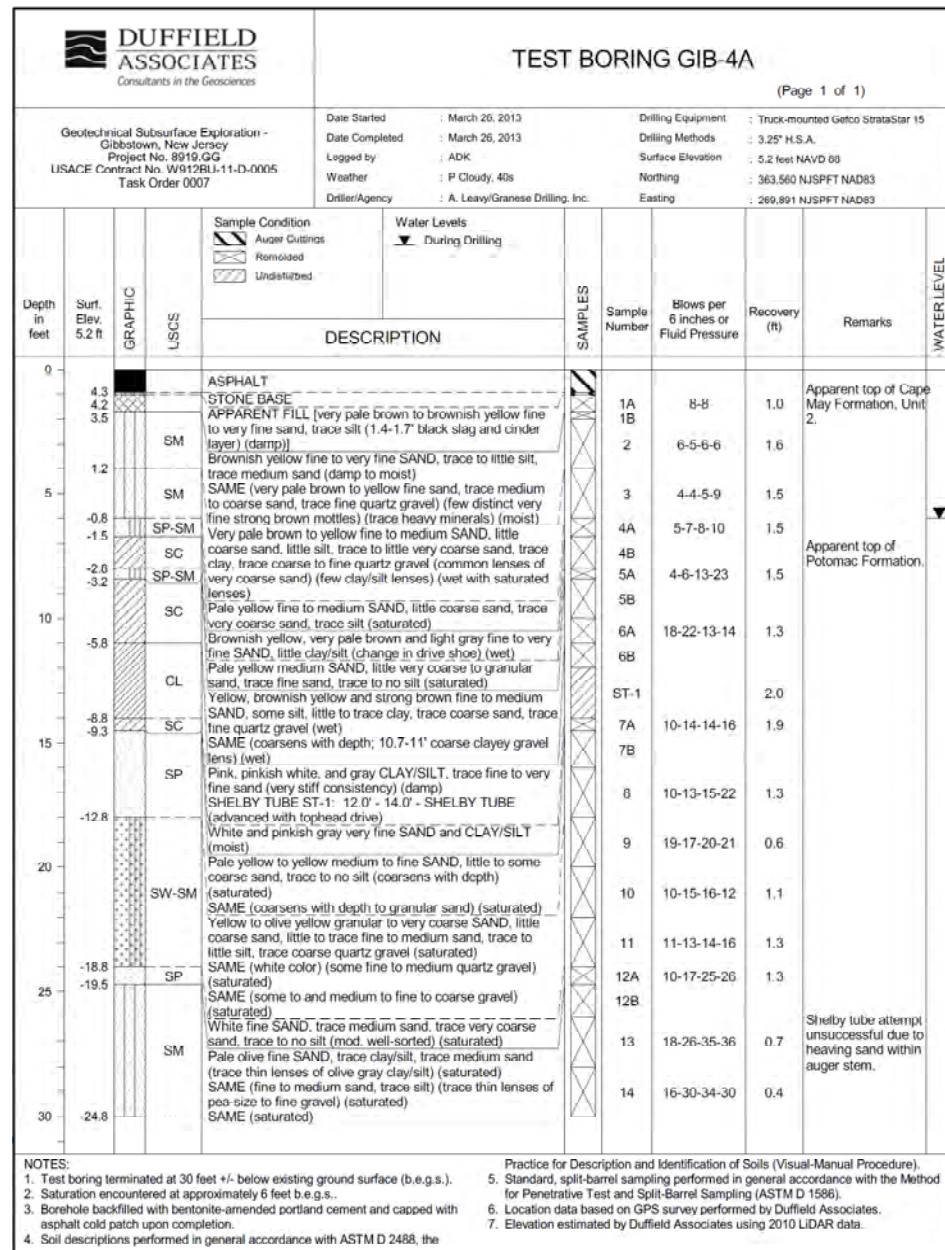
con't: Geotechnical Subsurface Exploration, Gibbstown, New Jersey – Test Boring Logs
